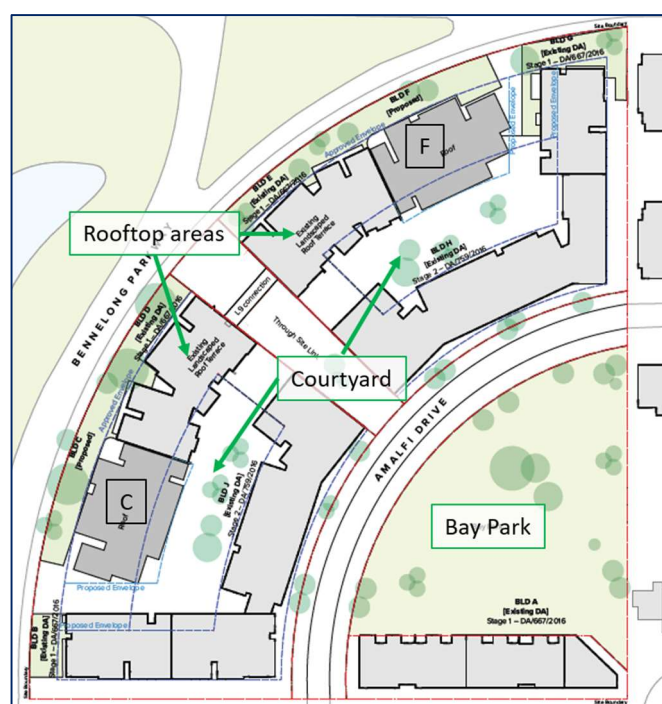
| Location of communal open spaces in the site (Source: FRtS Modified Concept Plan Drawings)
